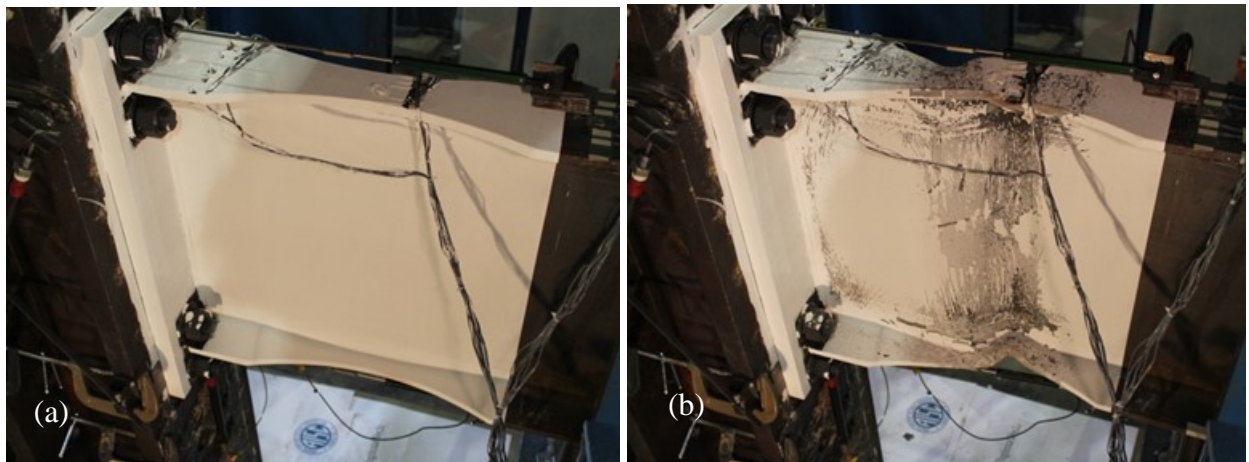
Angled View Pictures of Specimen 5 (W24x62 with RBS and Puddle Welds) at (a) Start of Test, and (b) Prior to Fracture
